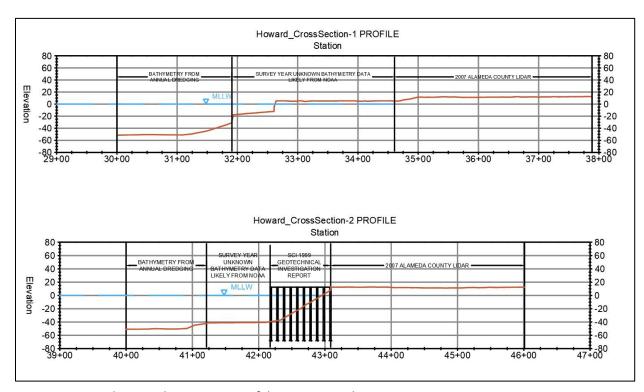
Howard Terminal Cross Sections of the Existing Grade
